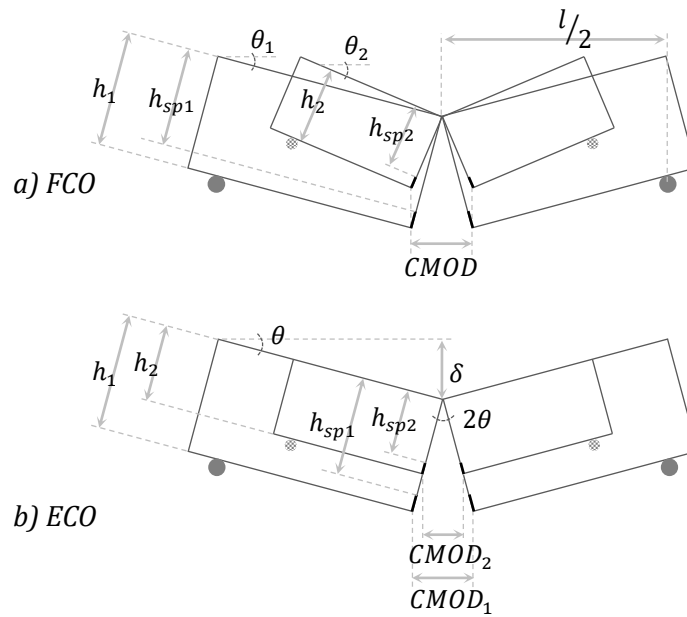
Failure mechanisms of the three-point bending test: a) FCO and b) ECO
